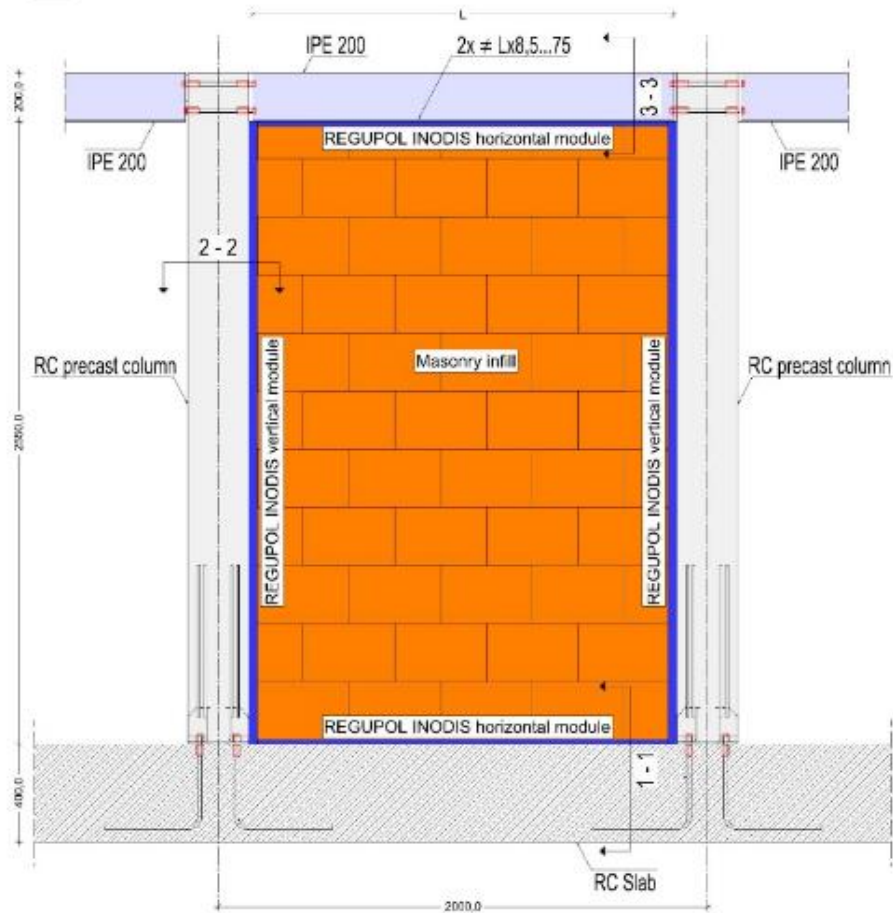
Adopted concrete-steel frame with infill and INODIS design
